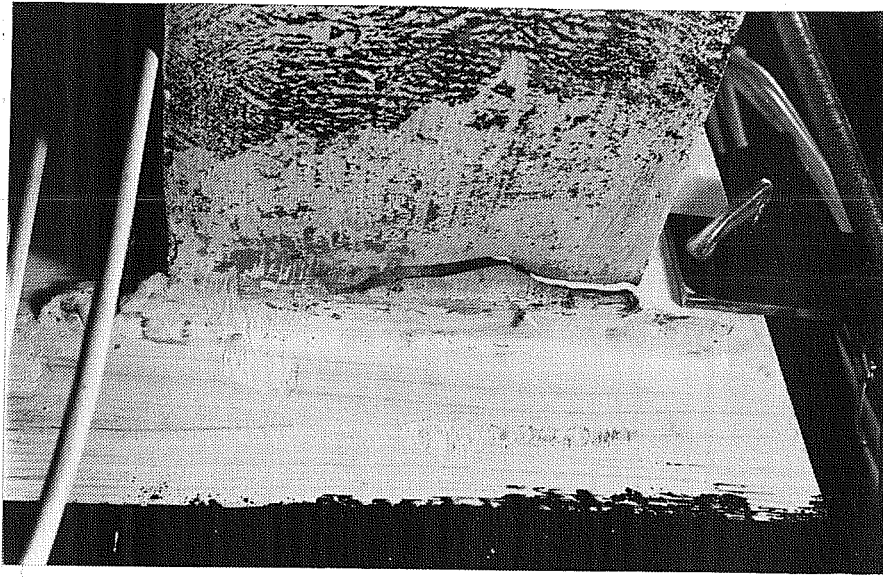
Crack Initiation at Bottom Flange of Specimen 3
